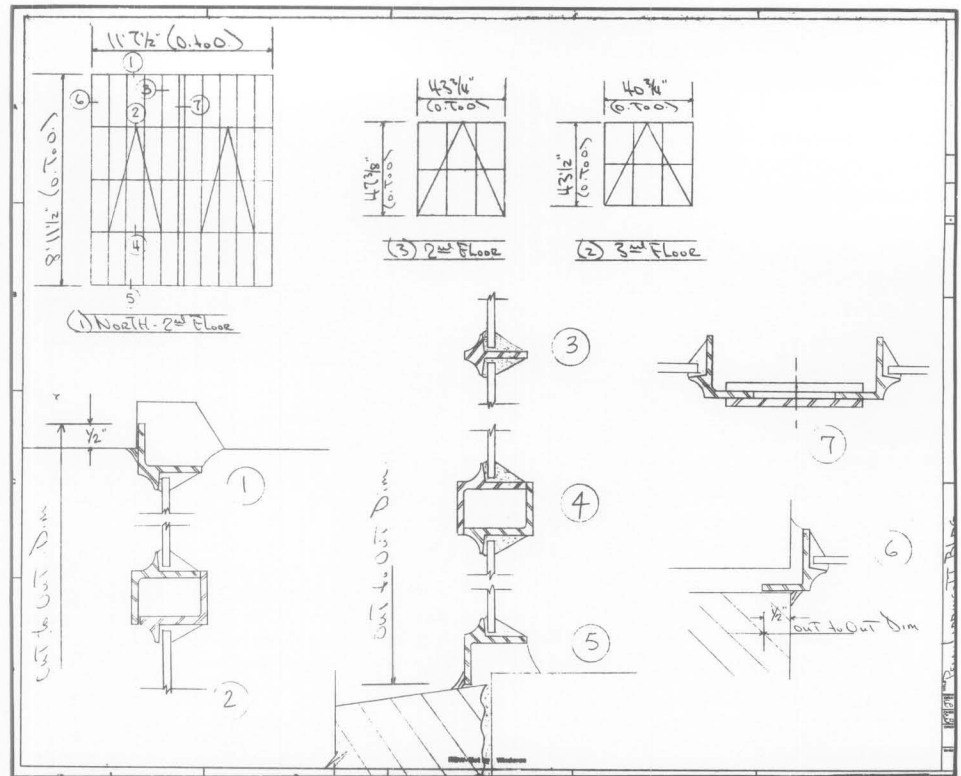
Sectional drawings of replacement window manufactured by A & S Window. Drawing: Winderco, Inc.
